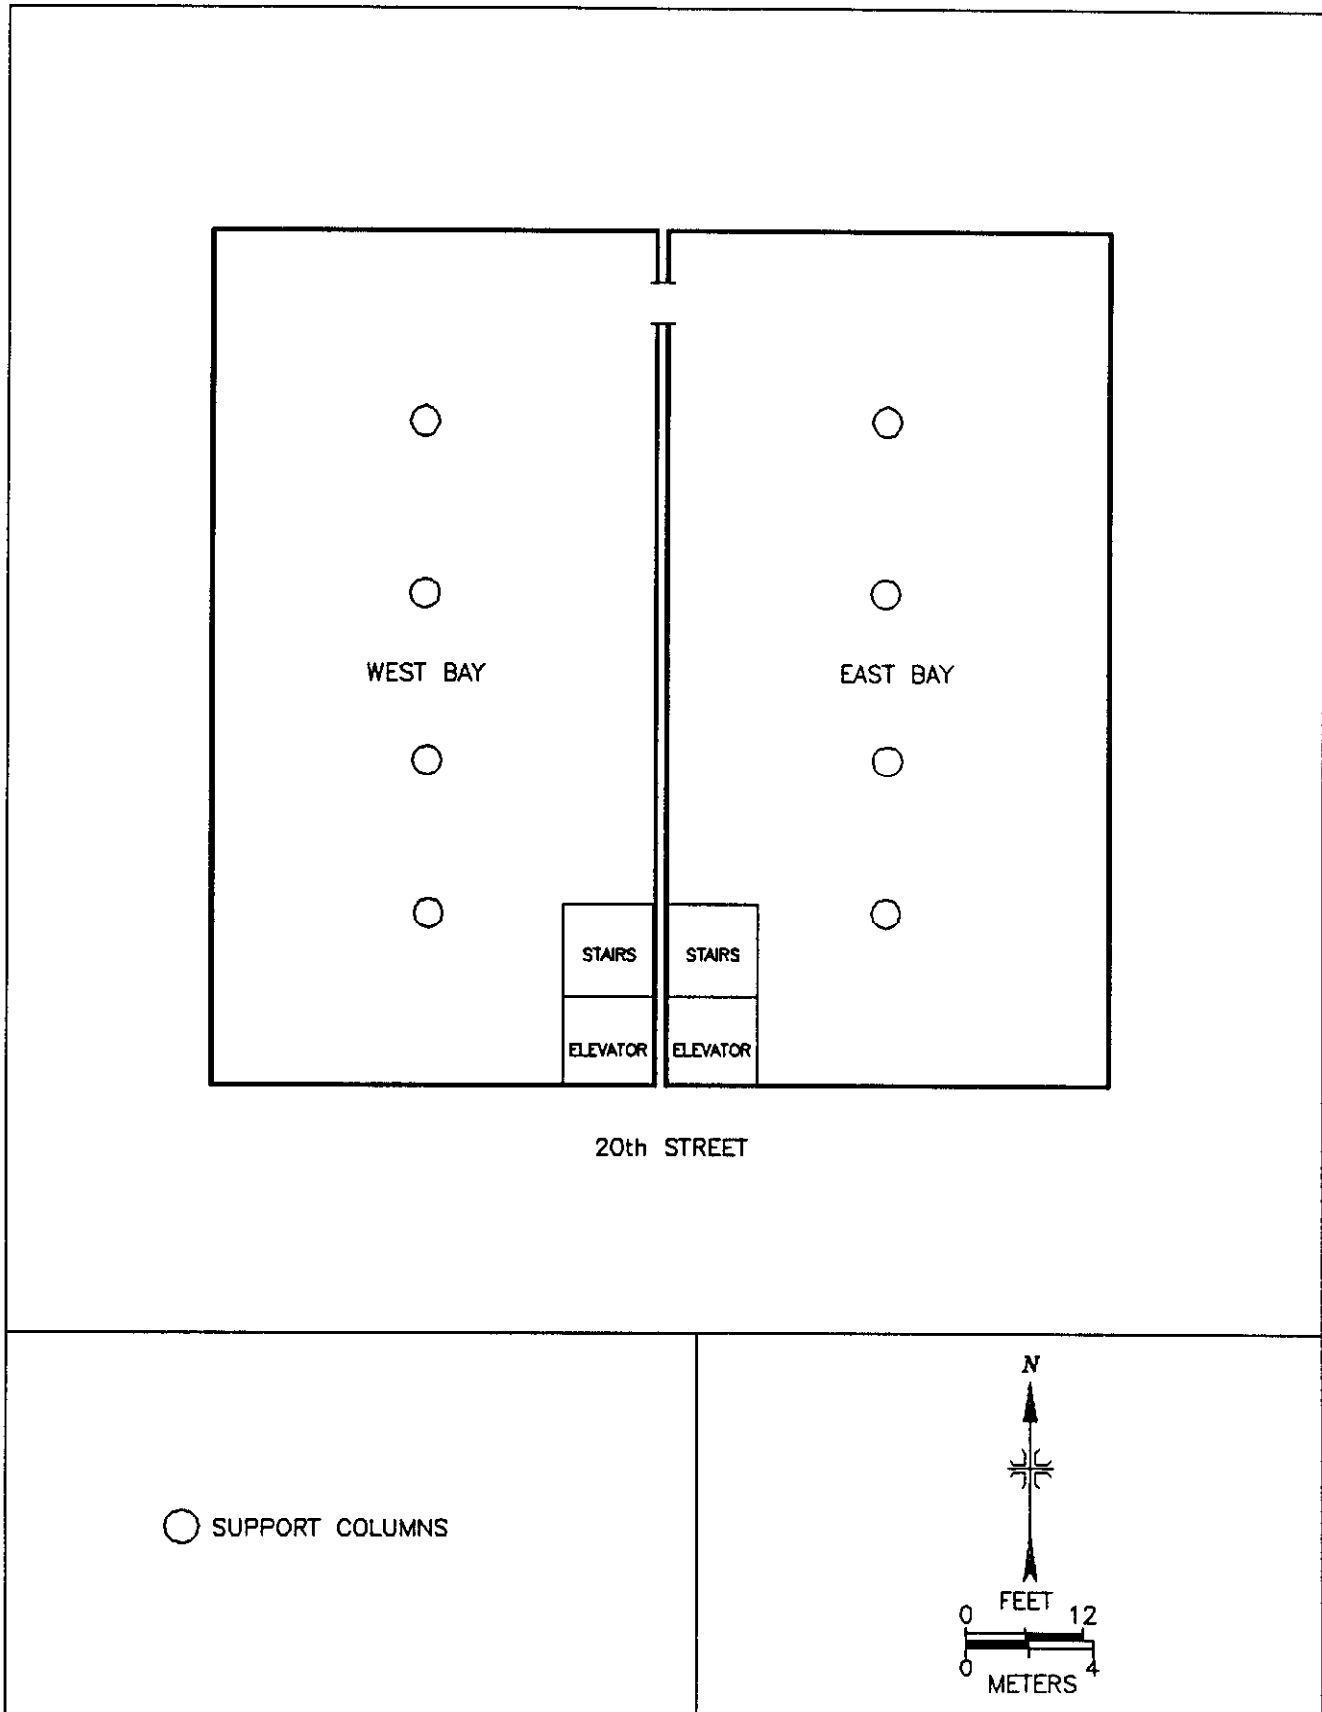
Baker and Williams Warehouses, Building 513-519 – General Floor Plan
